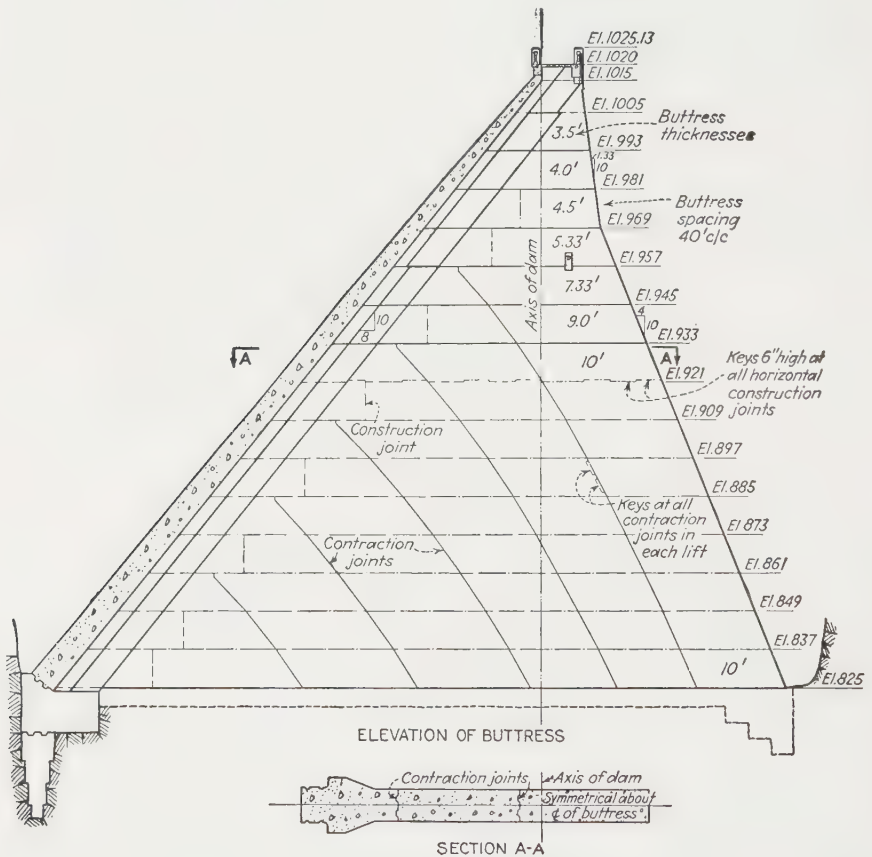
Possum Kingdom Dam (renamed Morris Sheppard Dam). Bulkhead buttress and sections; keys in contraction joints (inclined joints).
